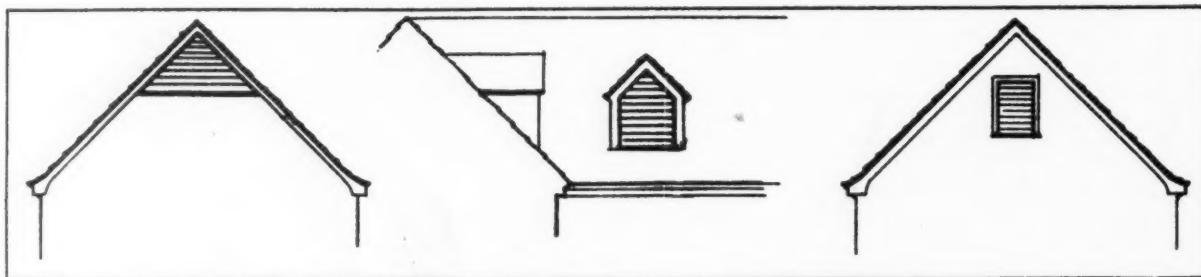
Some common forms of attic ventilating louvred openings. Drawing from American Blower Co. Manual. Where possible, openings should be near the ridge.
